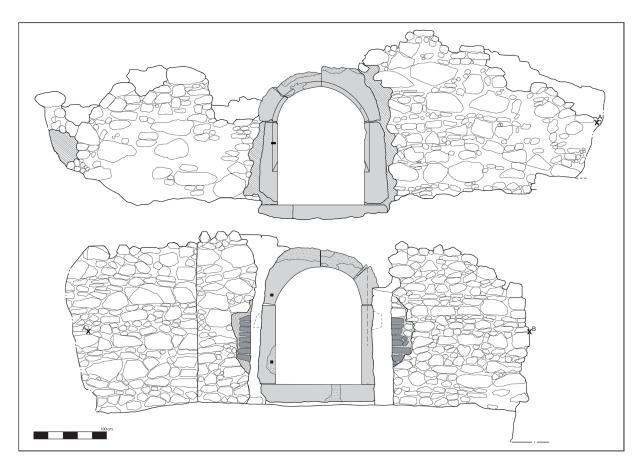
The drawings of excavated walls of the northwestern tower (Dóra Hegyi, Gergely Szoboszlay).
